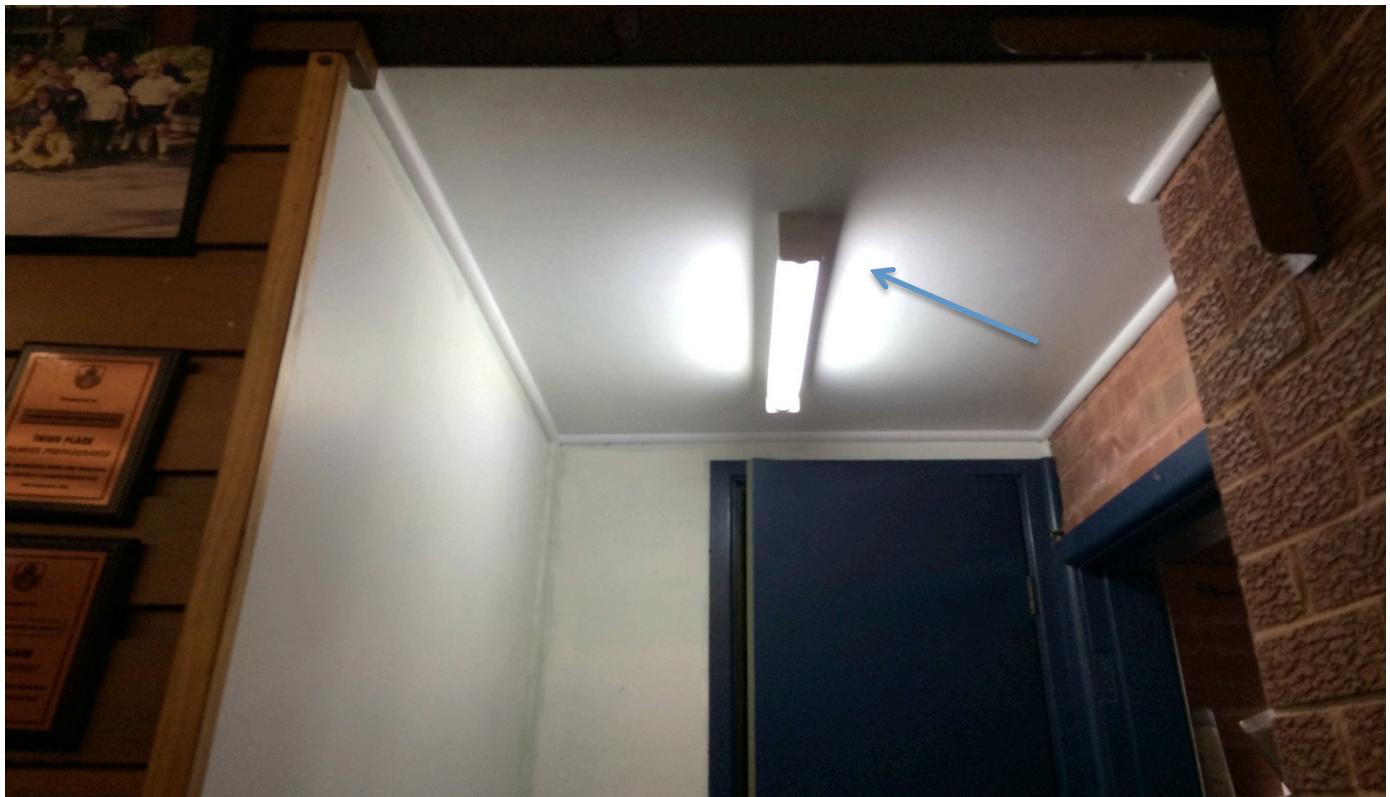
Fibreboard ceiling panel assumed to contain asbestos outside the Jacket Storage cupboard in the western garage of the Glenbrook Rural Fire Service Bushfire Station.
